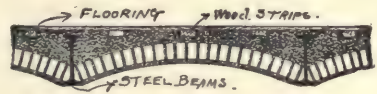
A Floor with Brick Arches, Levelled up with Concrete and Wood Strips, Imbedded for Flooring.
